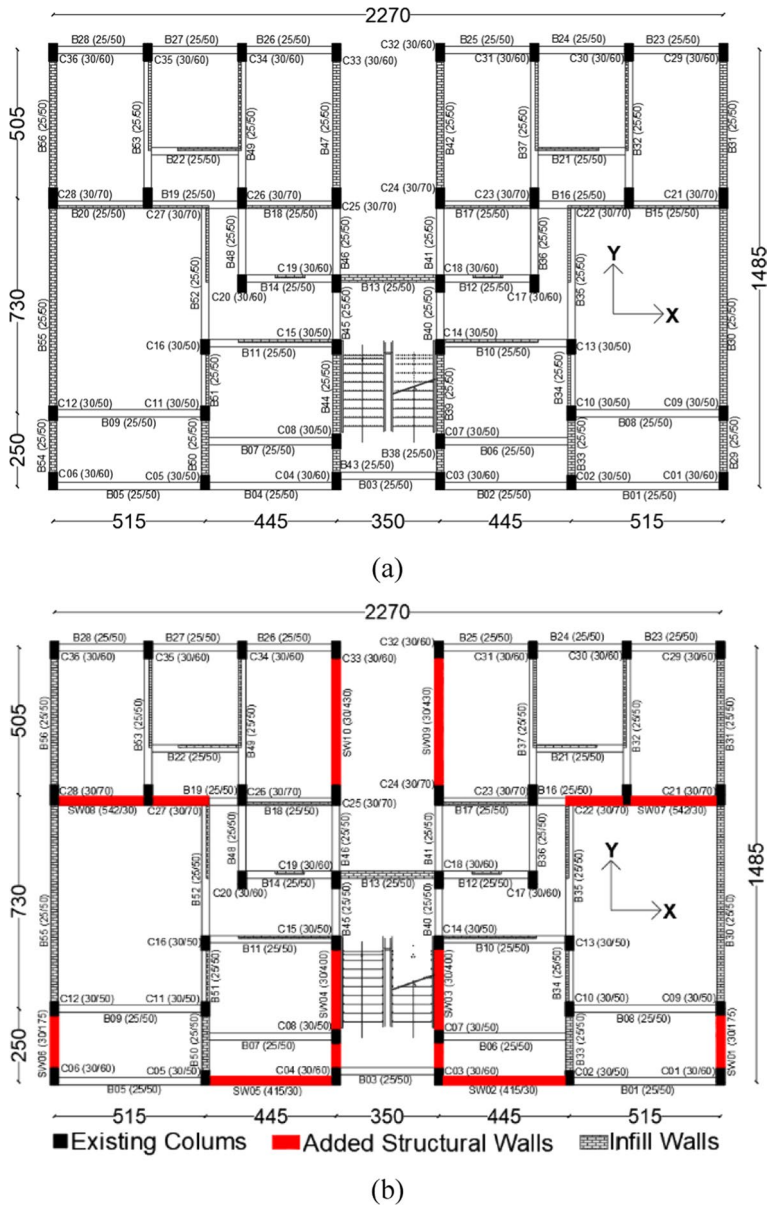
Floor plan of investigated buildings a non-retrofitted b retrofitted (units are in [cm])
